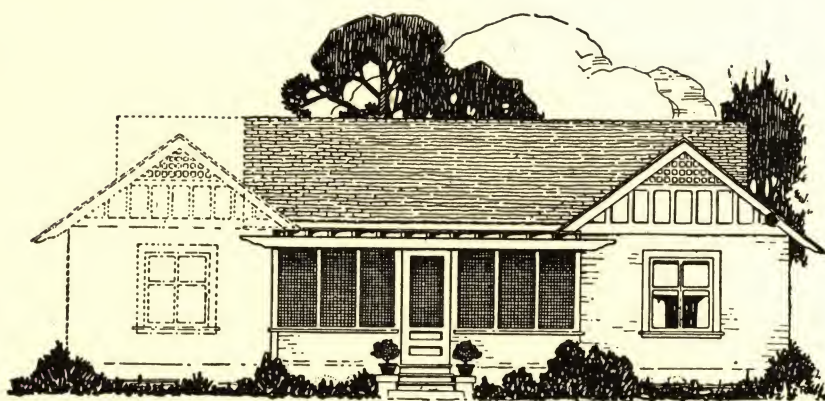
A 3-Room House to Which Two Bedrooms and Bath May Be Added
